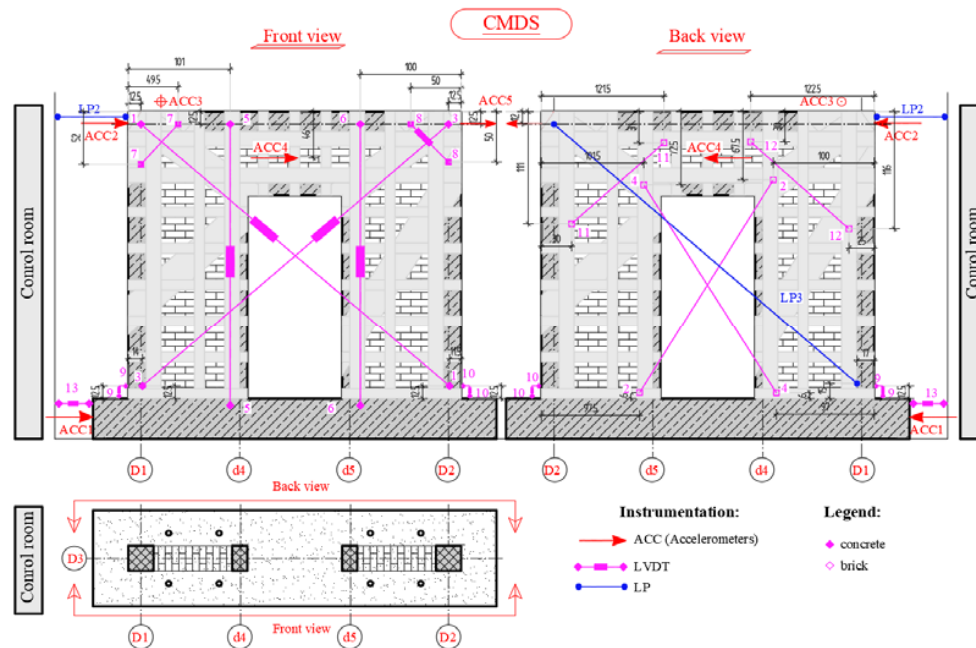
Instrumentation scheme of specimens CMDS – technical drawing (front and back view)
